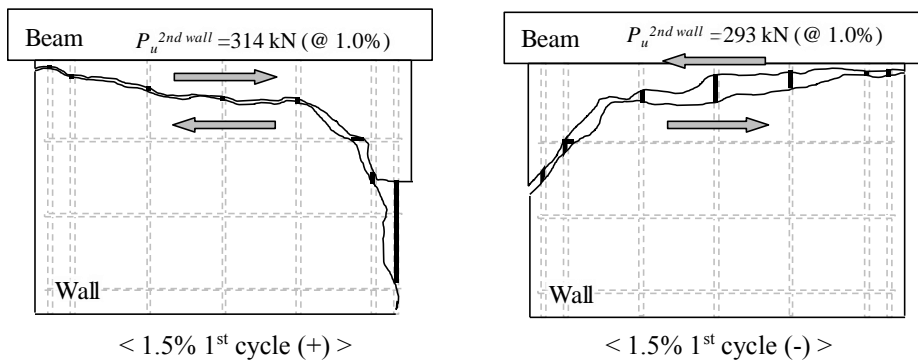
Failure mode of second-story shear wall in specimen WF
